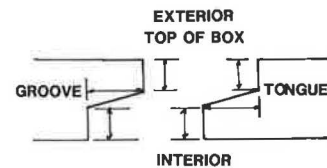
Joint configuration of precast reinforced concrete box culverts.
